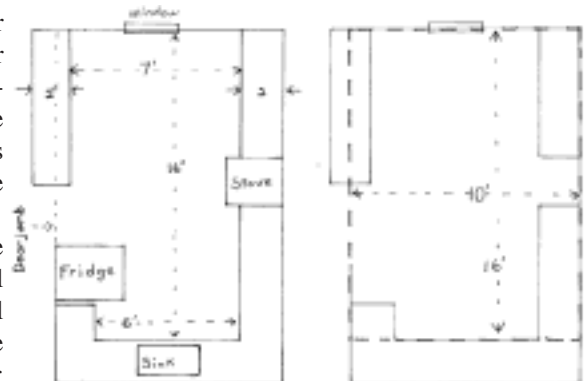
The layout of a typical room and the actual size of sheet flooring required to lay vinyl in it.
